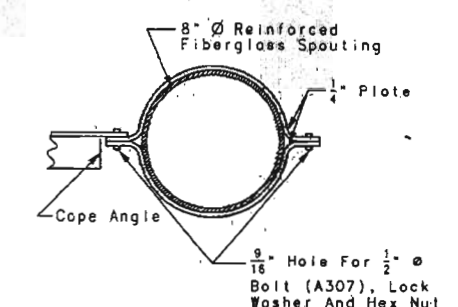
DETAIL OF PIPE STRAP ON CONCRETE BEAM CAP
